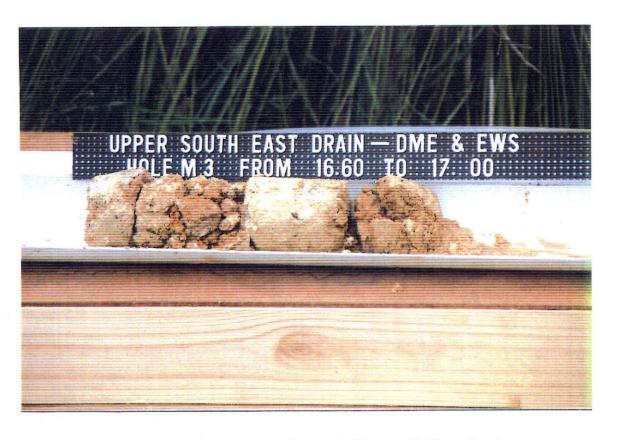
SITE 1, Borehole M3. Core sample f: 6.60 m to 17.00 m depth Photo No 40295
